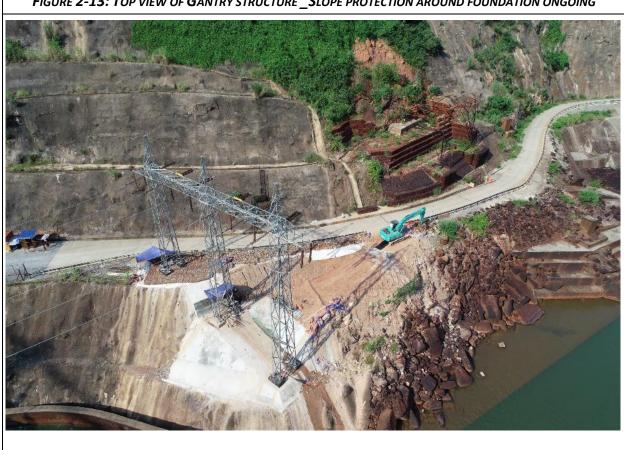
TOP VIEW OF GANTRY STRUCTURE _SLOPE PROTECTION AROUND FOUNDATION ONGOING
